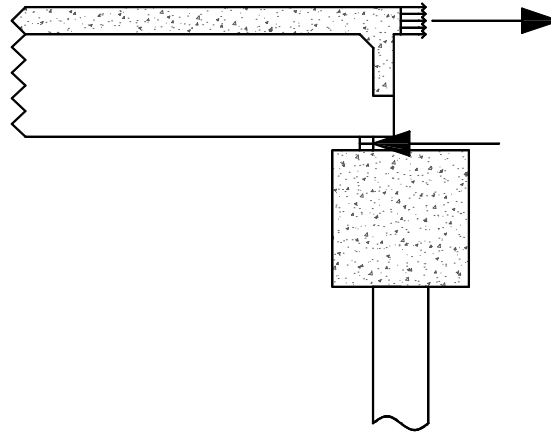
Possible Tension/Compression Couple at Bent 2 in the Conventional Bridge
